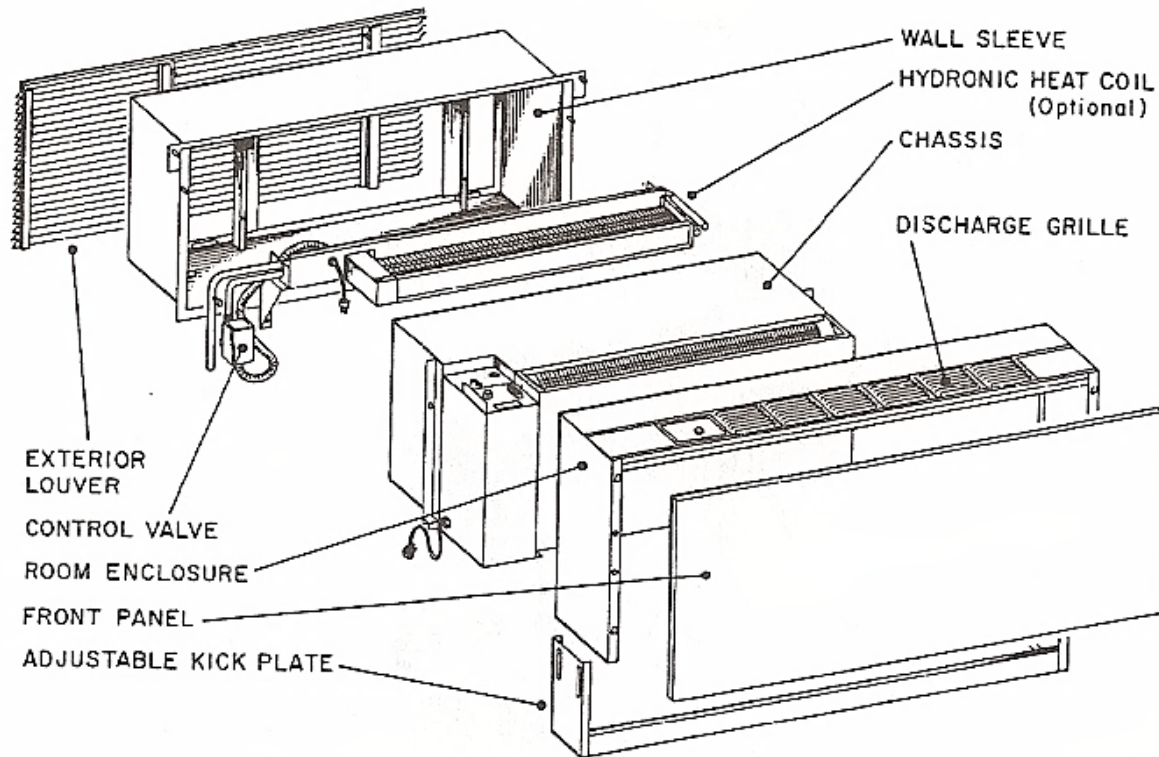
Packaged Terminal Air Conditioner with Separate Heat Section and Cooling Chassis
